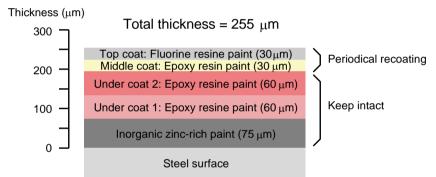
Heavy-duty coating for Honshu-Shikoku Bridges
